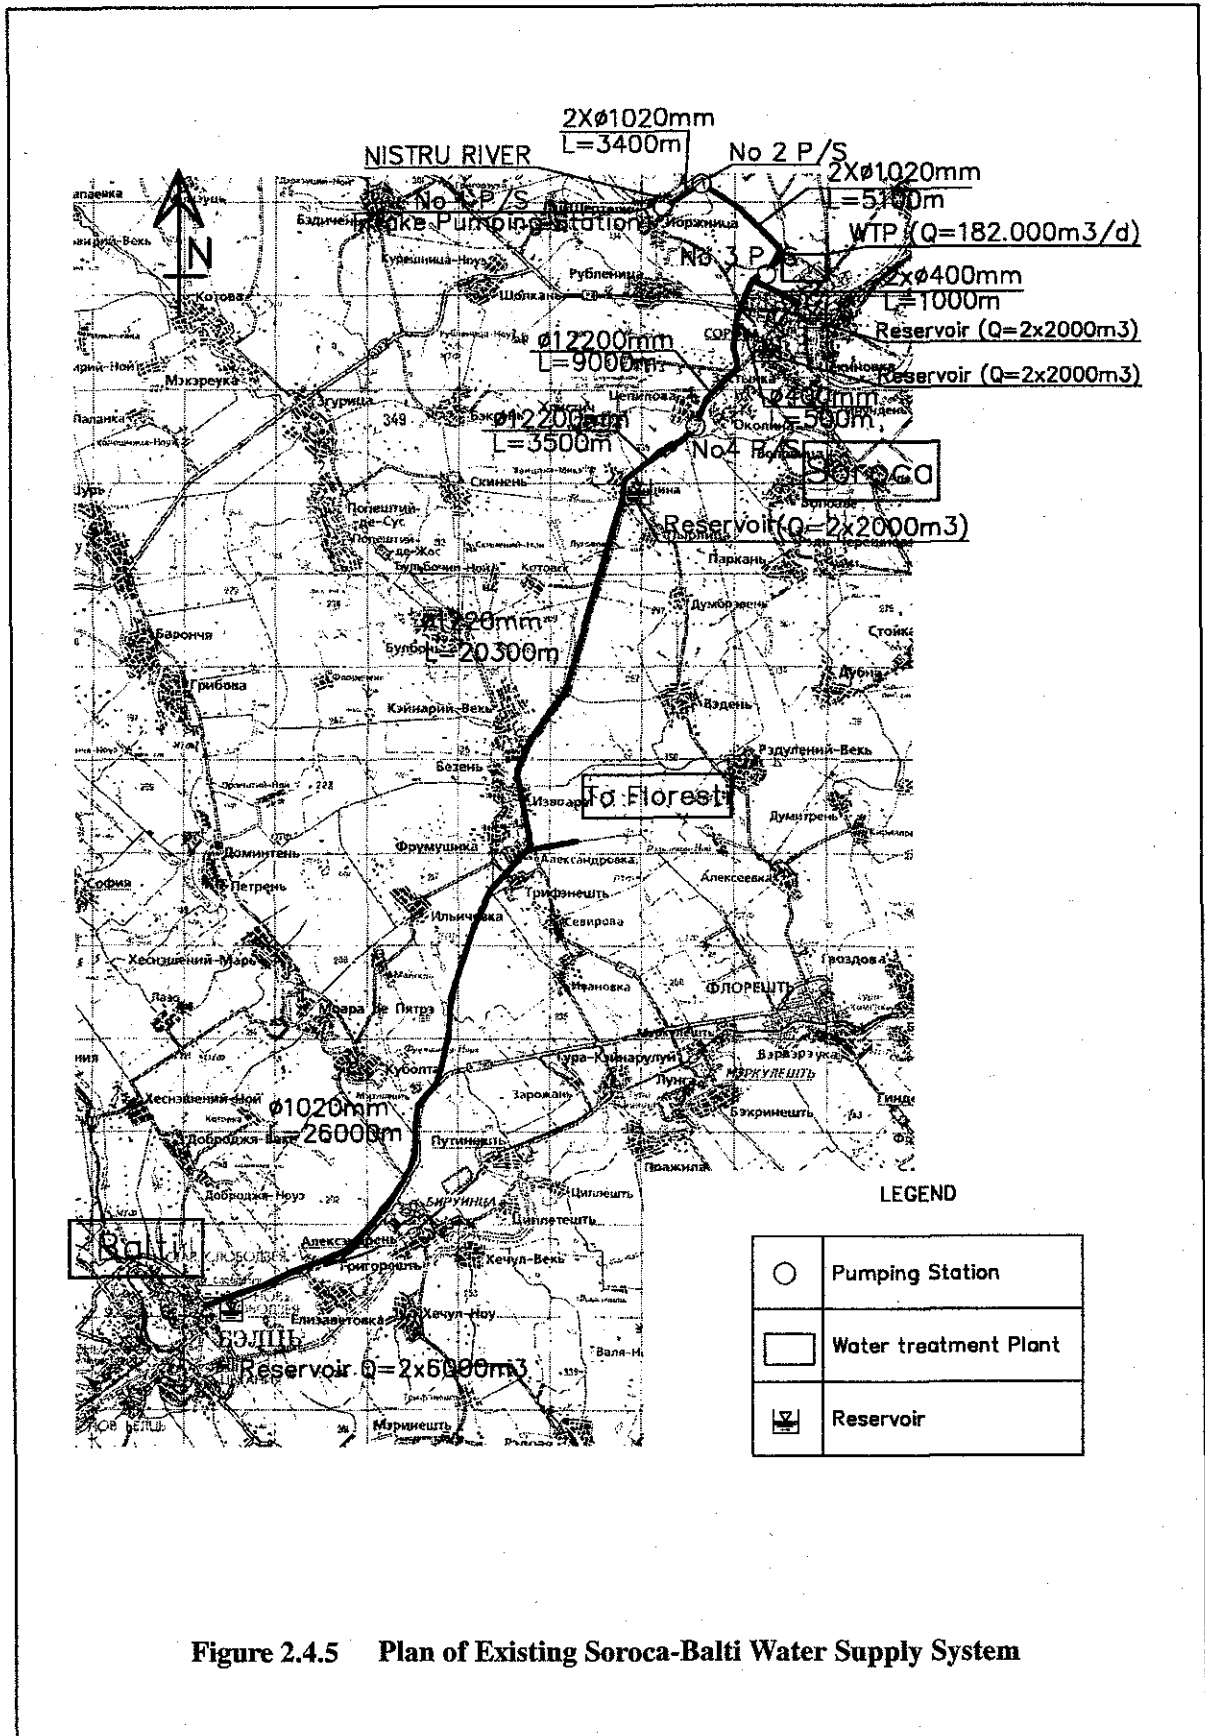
Plan of Existing Soroca-Balti Water Supply System
